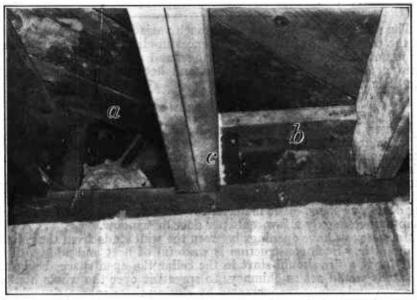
Stopping openings to stud spaces: a, opening left by builders, with plaster fallen through; b, piece of 2 by 6 tightly fitted to close opening; c, rock wool used to calk cracks.
